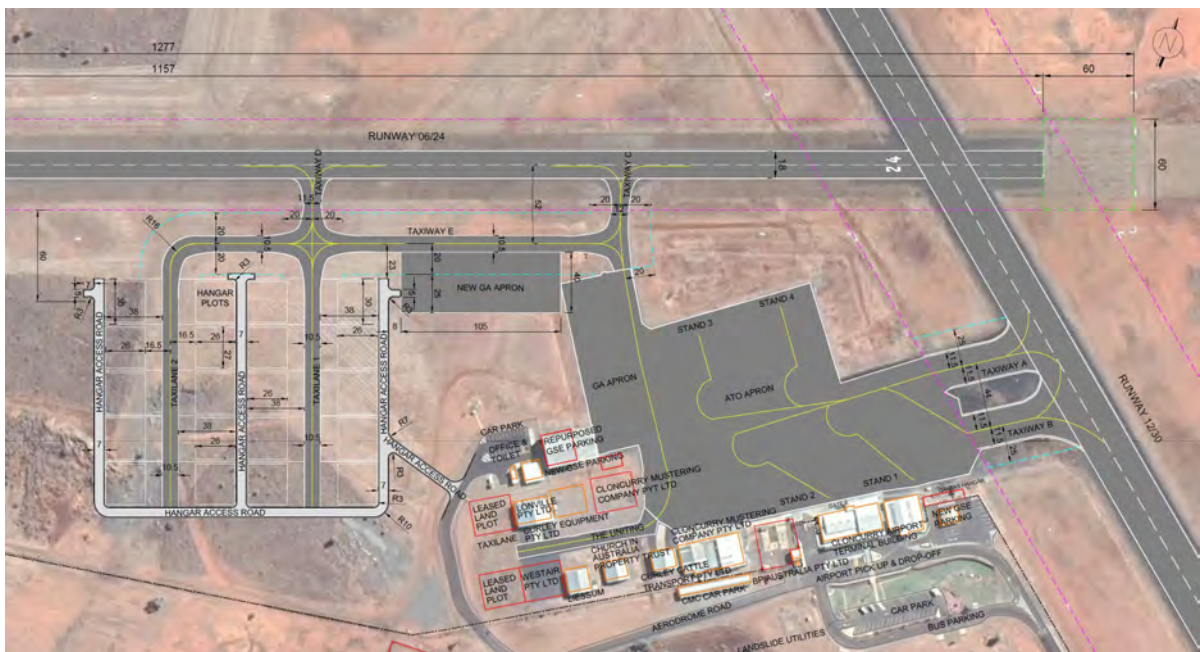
New and Improved Infrastructure Layout (Focal Area)
